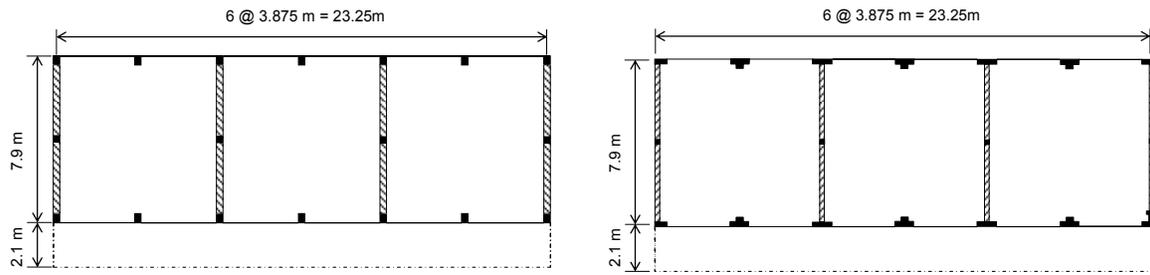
Plan for template school buildings in Peru built per 1977 (left) and 1997 (right) codes. Solid rectangles/squares/T-shapes: columns; hatched: confined masonry walls; solid lines: perimeter masonry infill walls. The 2.1m balcony overhang is also shown.
